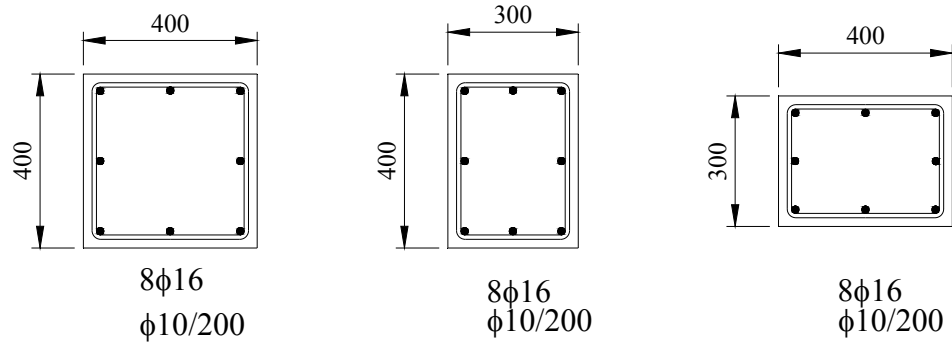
Reinforcement scheme of the columns at the ground and first floors.
